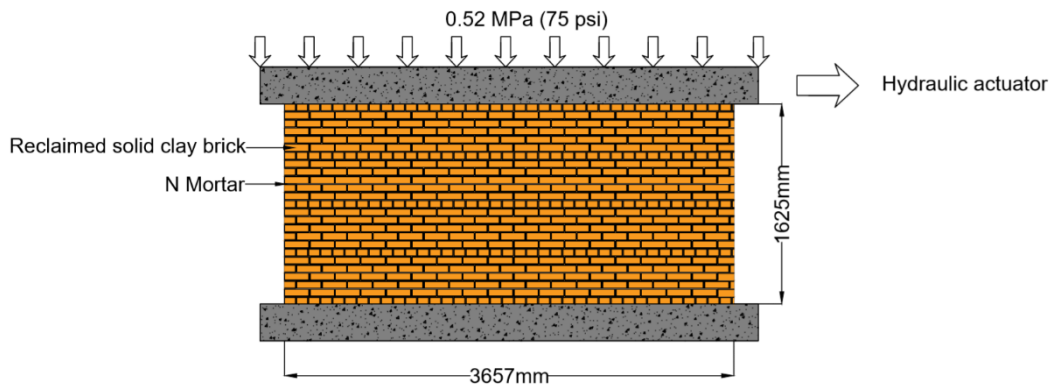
Test rig of masonry wall including concrete foundations and loading beam
